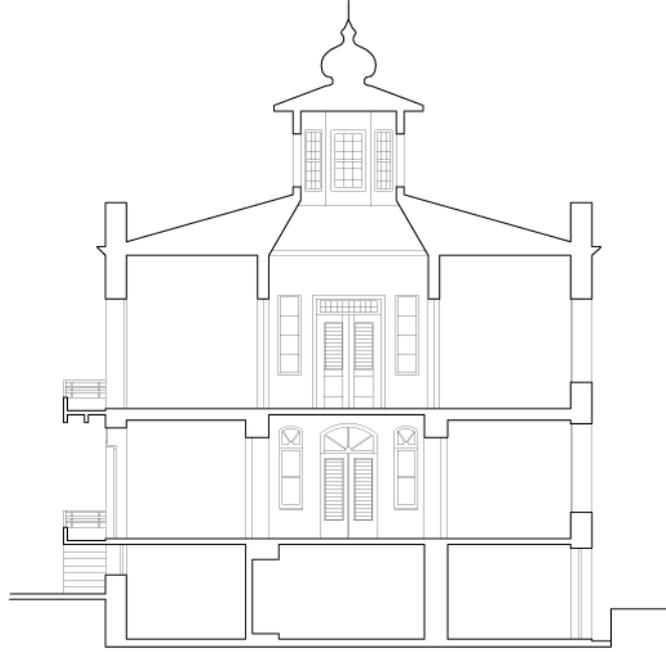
BB' section of the house at 63 lot 20 parcel
